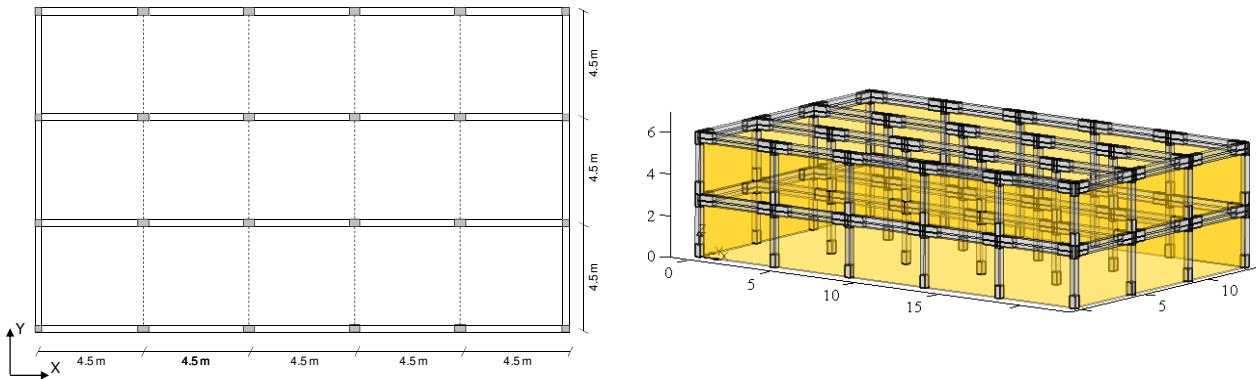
Plan view of case study buildings and 3D view of the 2-storey building
